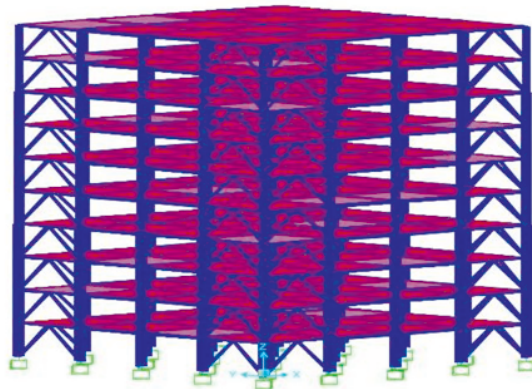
The 3D View of the 10 Story (High Rise) Building with CBF (SAP 2000).
